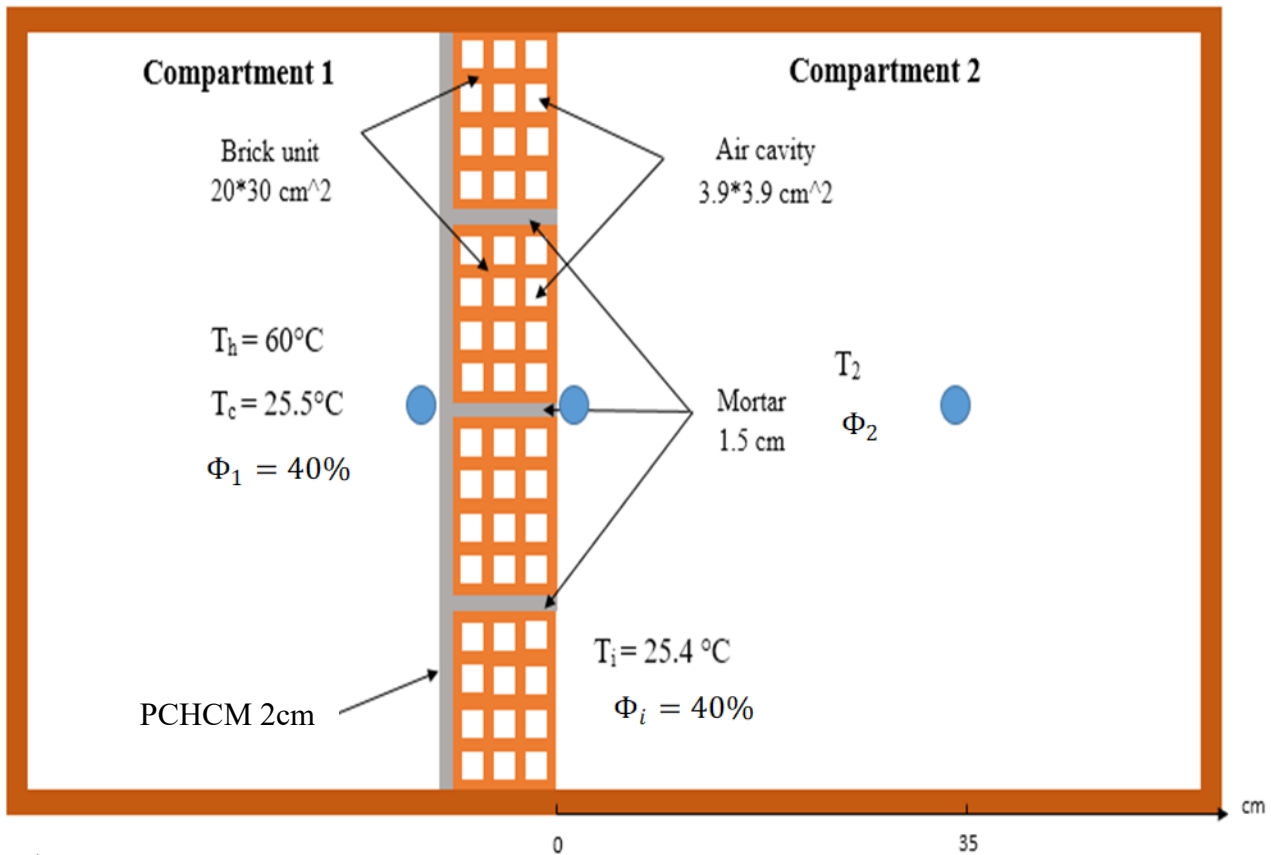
Brick wall with a PCHCM finishing layer.
